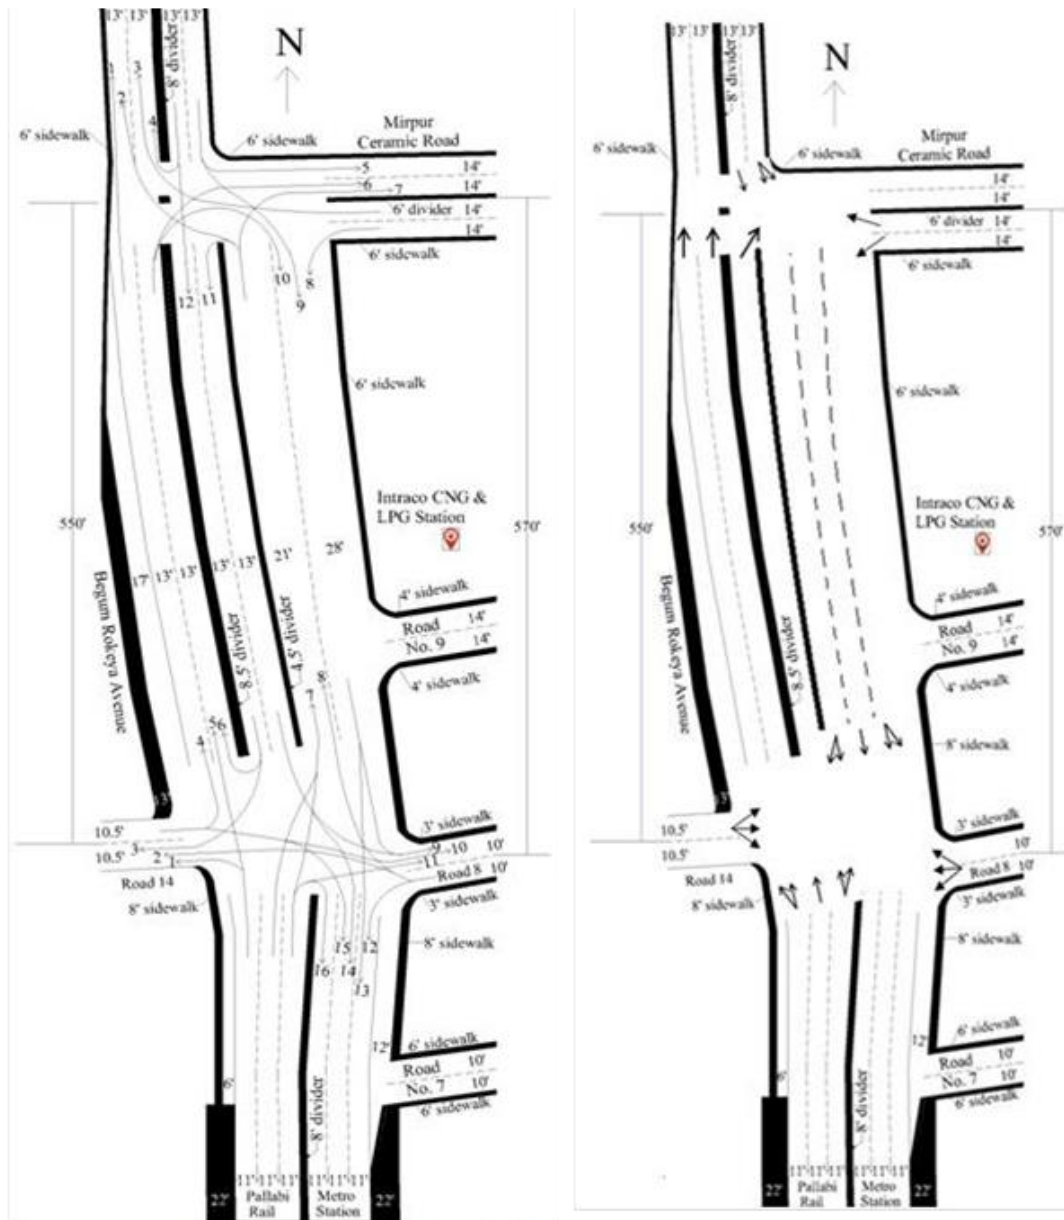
BRA (layouts of the existing intersections showing all conflicting movements) Figure 2b: BRA (layouts of the redeveloped intersections)
